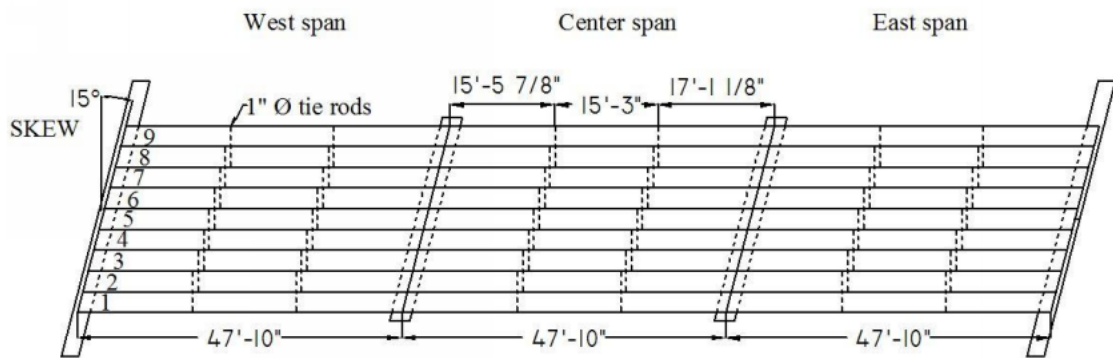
Plan View of Test Bridge (Setty, 2012)
